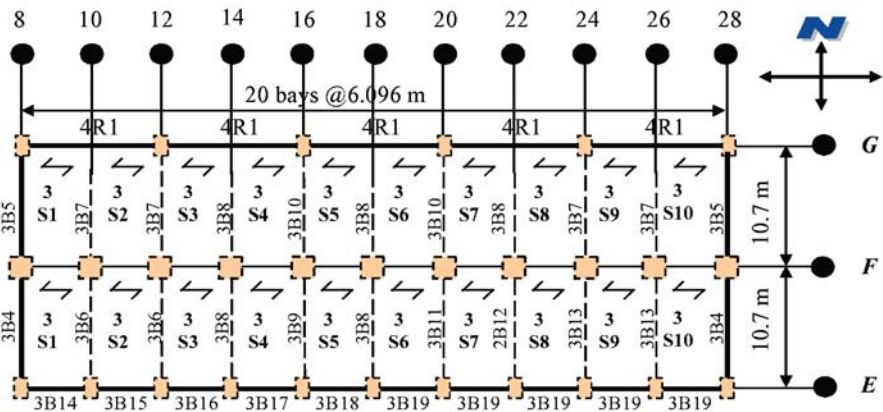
Plan of the roof (not to scale). Courtesy: Kirkpatrick Consultants, Oklahoma, U.S.A., 2002, T. Bangash, Ph.D. Thesis, London University, 2004
